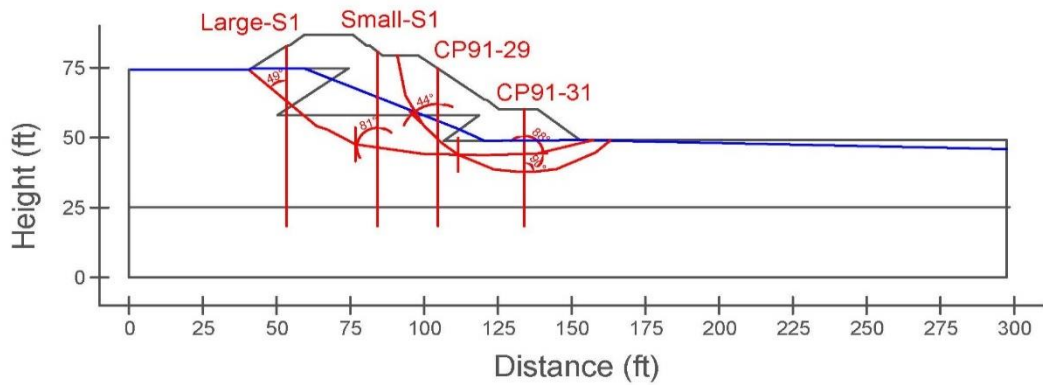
Sub-sectioning of the cross-section and failure planes for Sullivan Tailings
